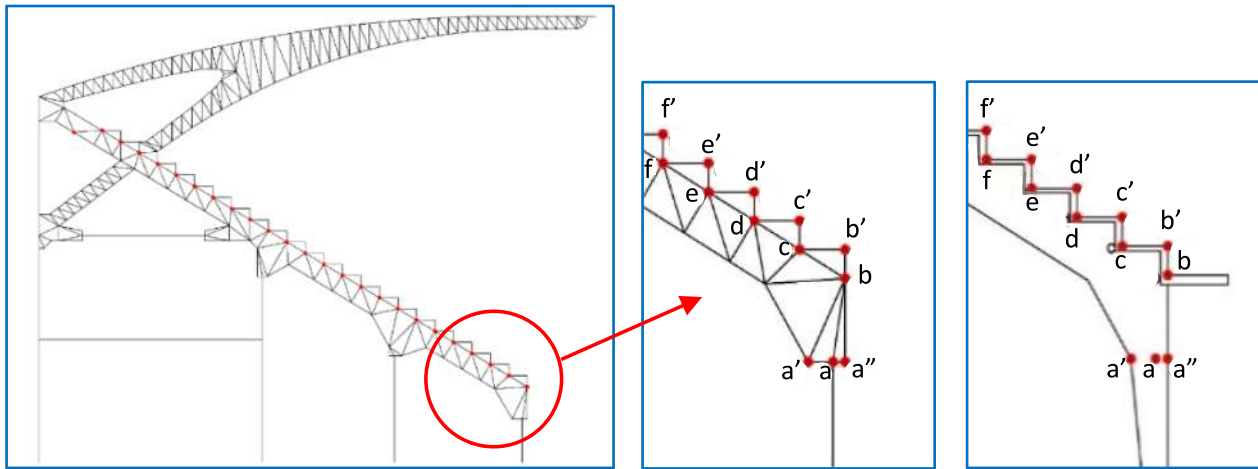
Finite element model of type 1 frame, and detailed view of the bottom beam-to-column joint and its connection to the bleacher beams.
